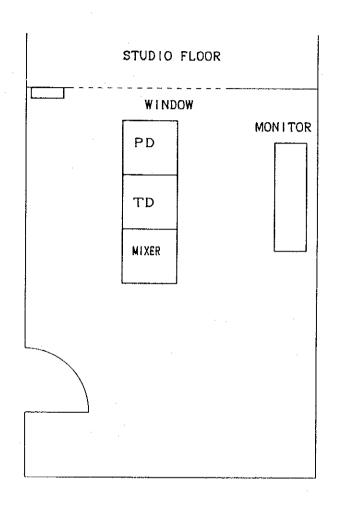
EQUIPMENT LAYOUT OF CONTINUITY STUDIO
